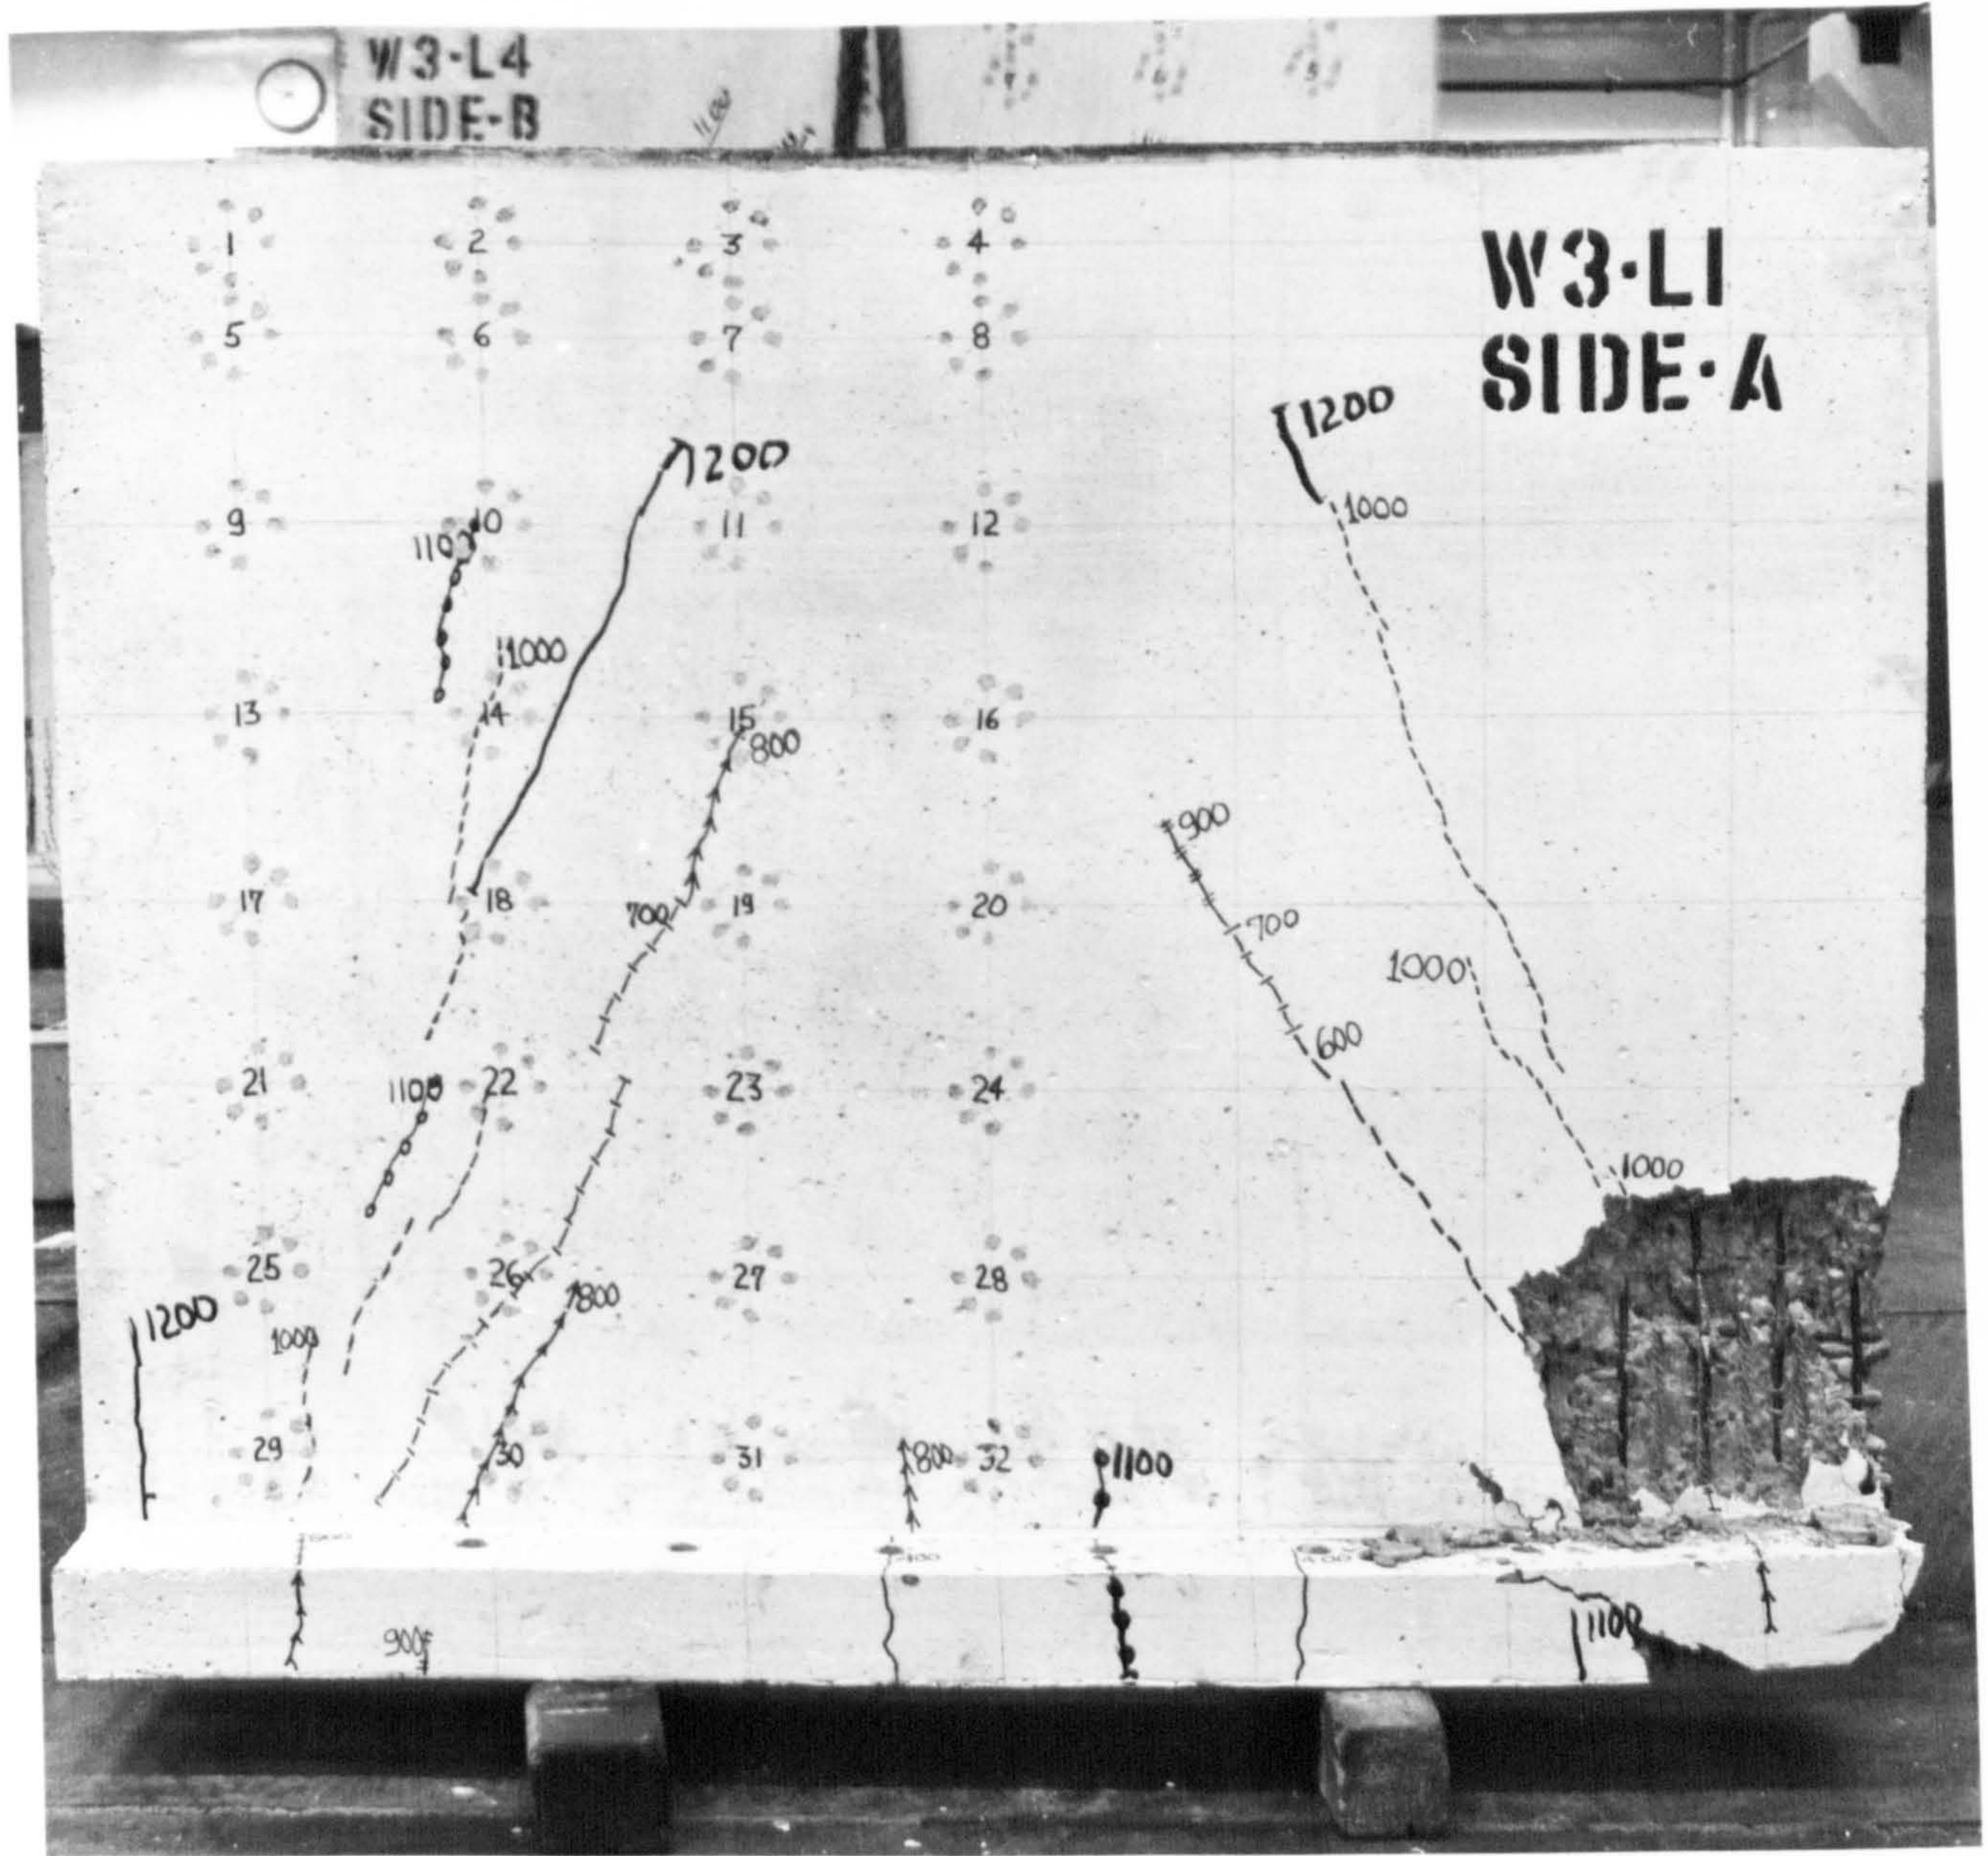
Final crack pattern at failure for specimen W3-L1
